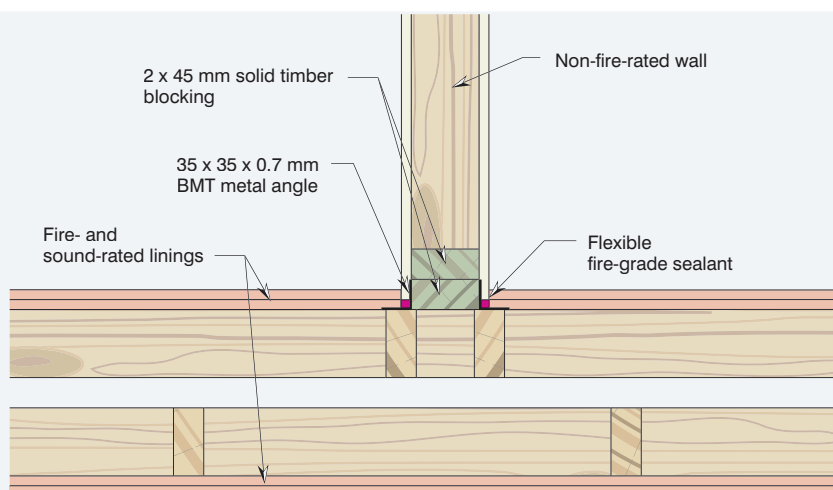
Timber sacrificial blocks used to close a gap for a 90 minute system – plan view.
